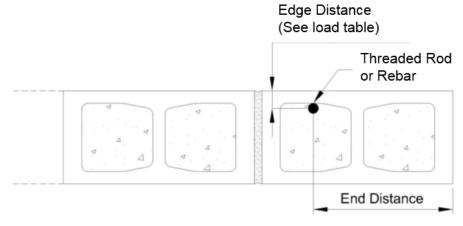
EDGE AND END DISTANCES FOR THREADED RODS INSTALLED IN THE TOP OF GROUT-FILLED CONCRETE MASONRY
